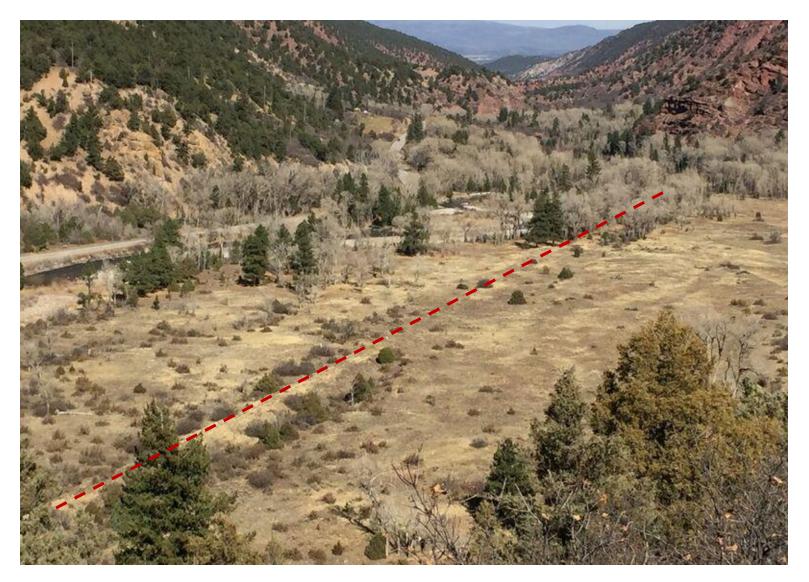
Another view showing where a paved path would be constructed for alignment B on the Janeway North section.
